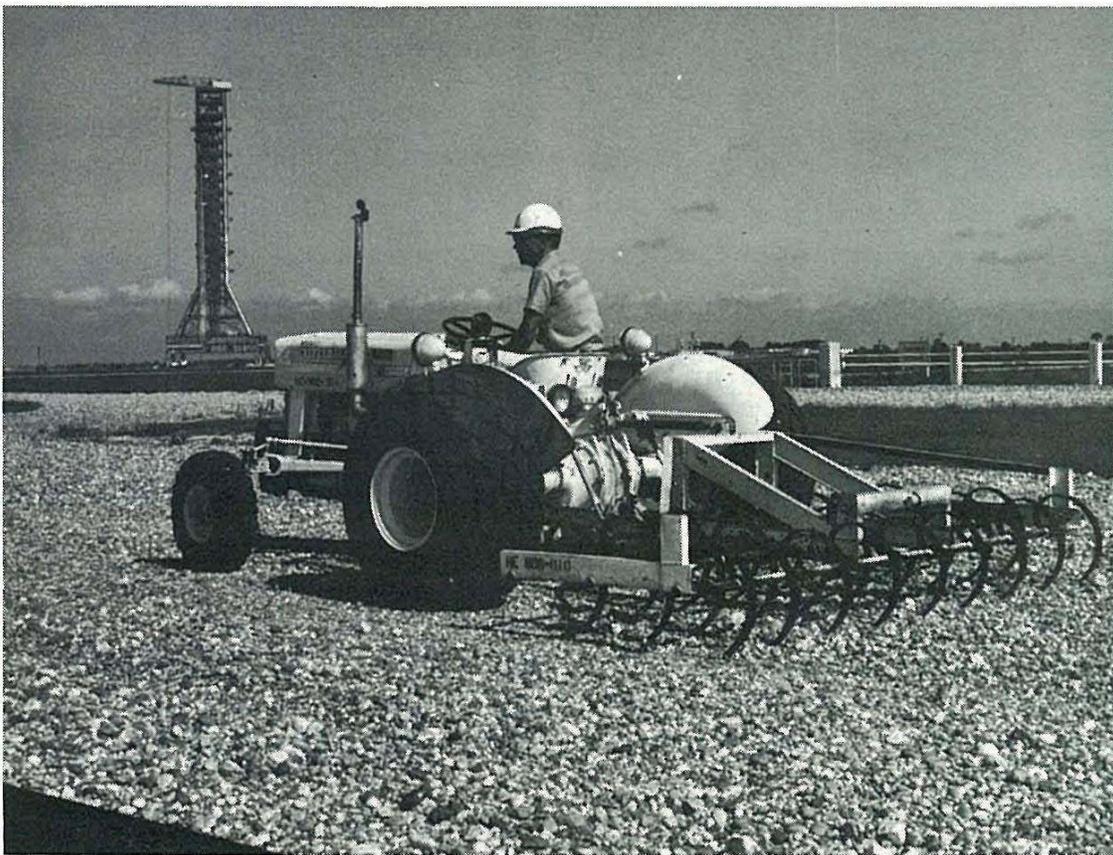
View of a springtooth harrow being used to smooth the Crawlerway surface.
